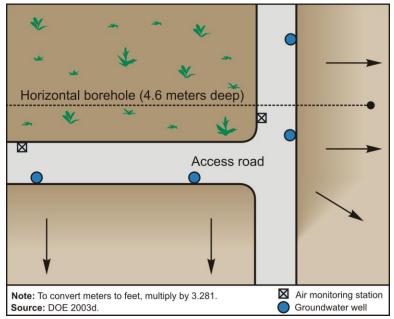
Plan View of a Barrier Lobe Corner with Monitoring Systems Installed
